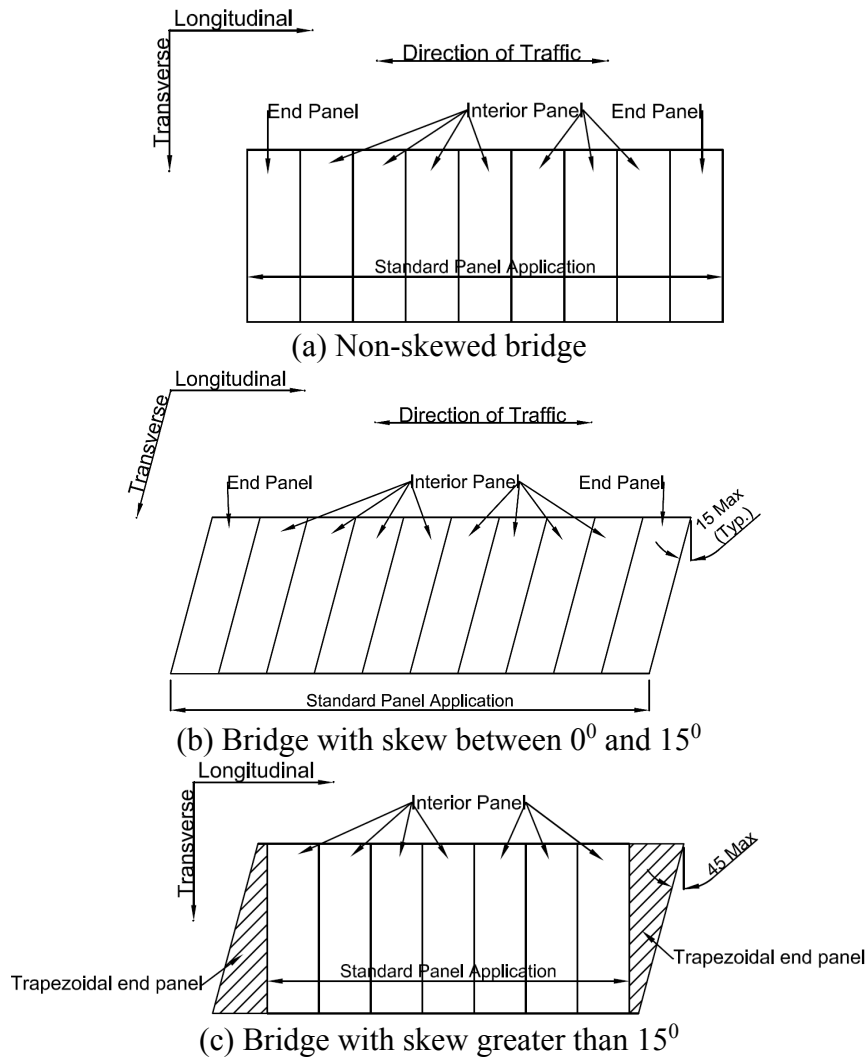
Standard full-depth deck panel applications (Source: UDOT 2010b)
